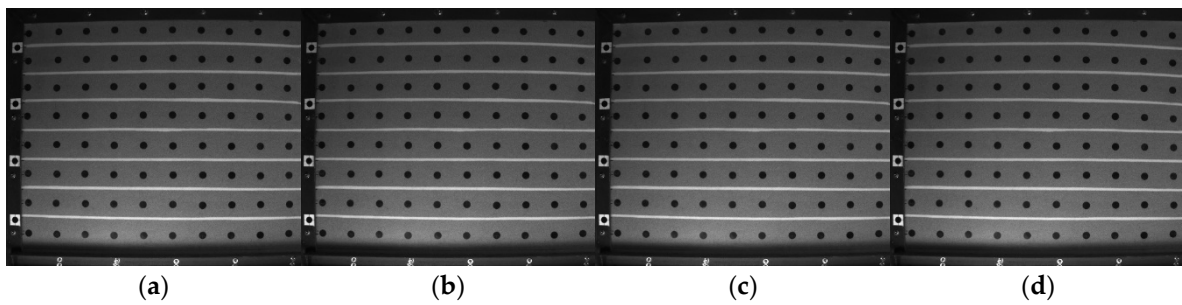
Side face photos of R1 for different excavation depths: (a) Excavation depth of 50 cm; (b) Excavation depth of 60 cm; (c) Excavation depth of 70 cm; (d) Excavation depth of 80 cm.
